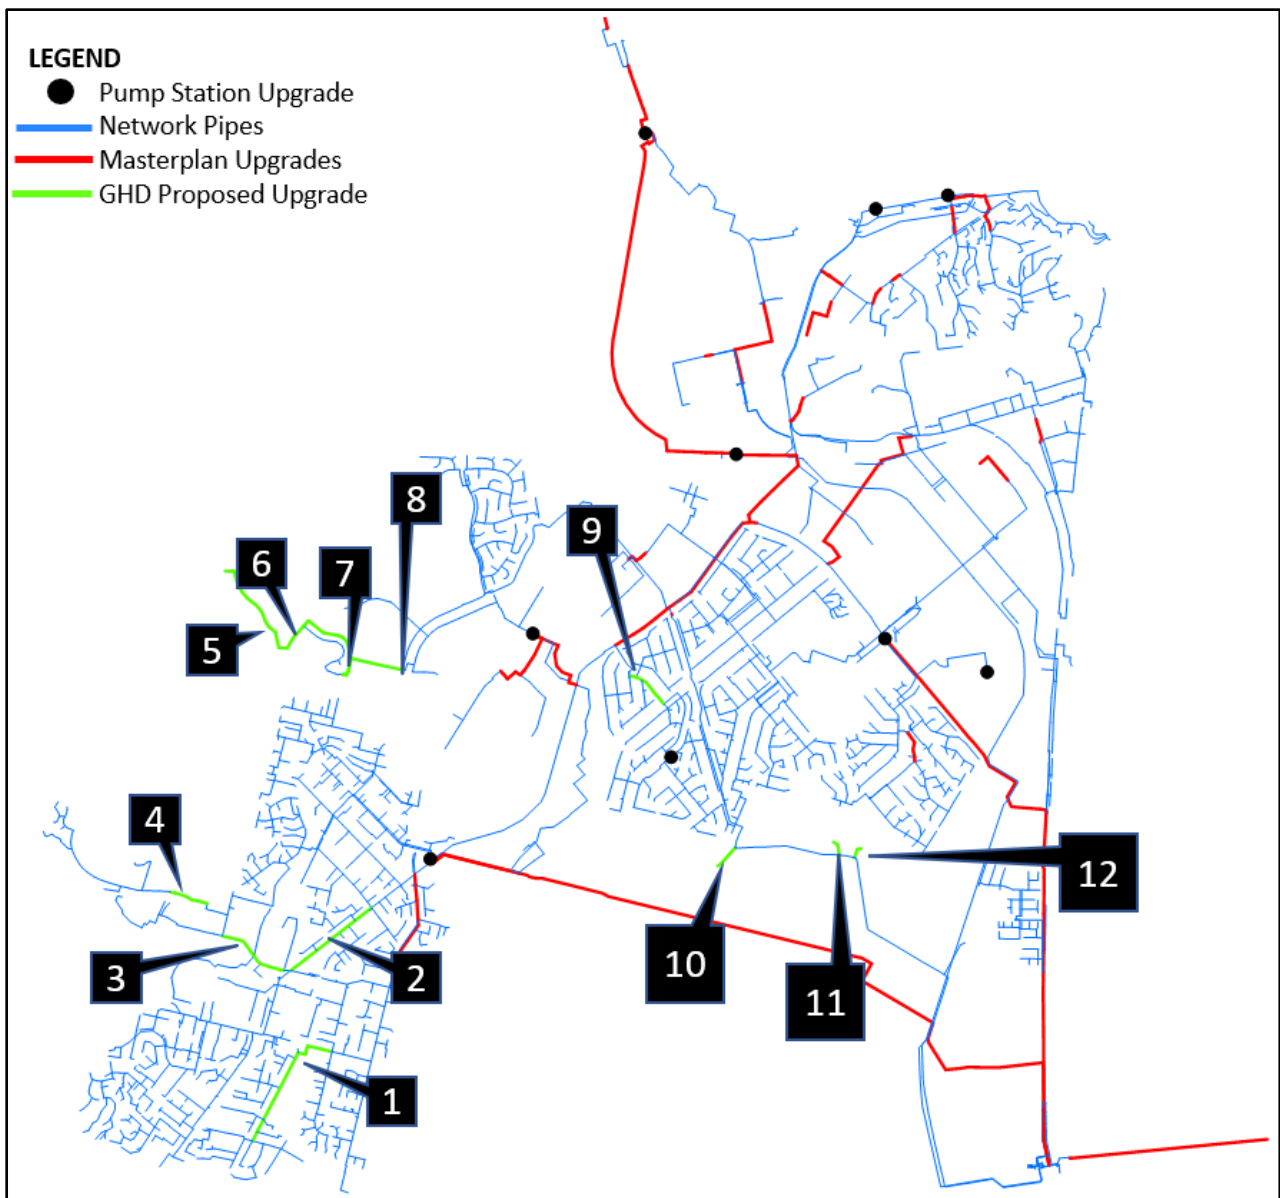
Plan of wastewater model masterplan upgrades and proposed upgrades
